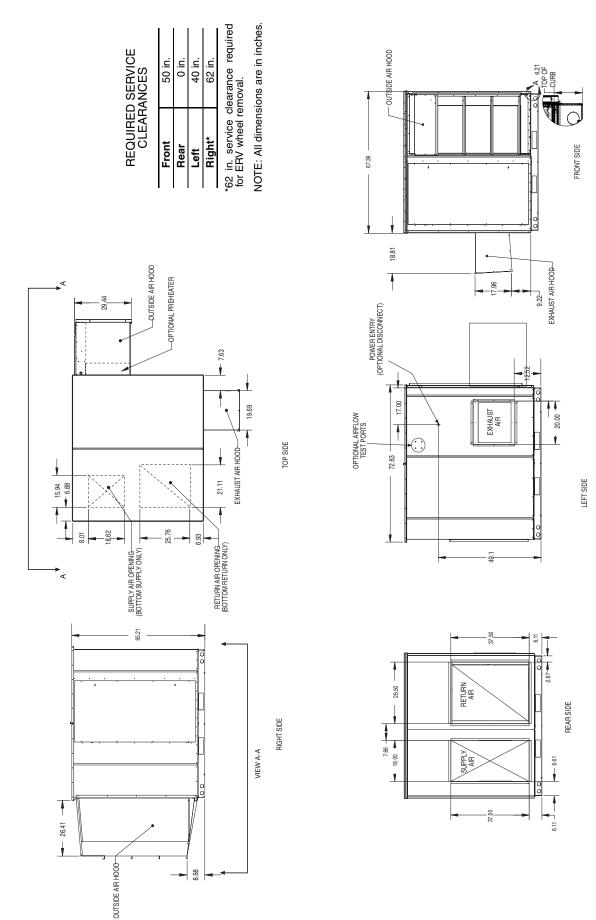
62MD, ME330-640 Outdoor Unit Dimensions
